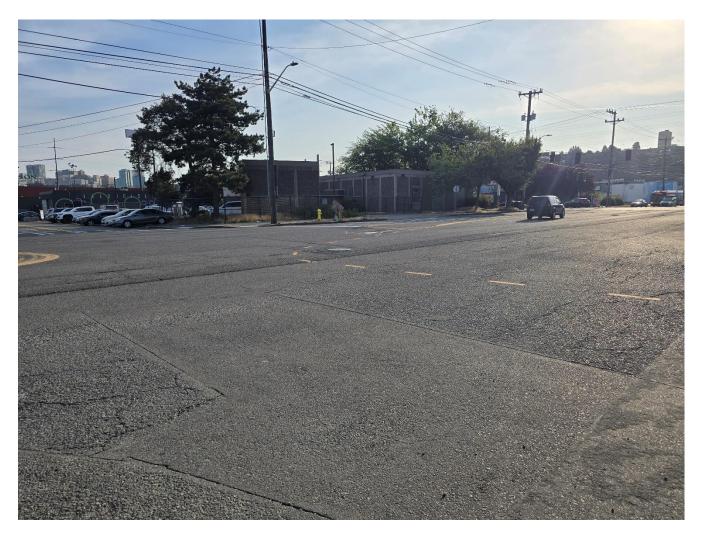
S HOLGATE ST AND 3RD AVE S, PAVEMENT CONDITION SHOWING ALLIGATOR CRACKING AND PATCHING, SW CORNER LOOKING NE
